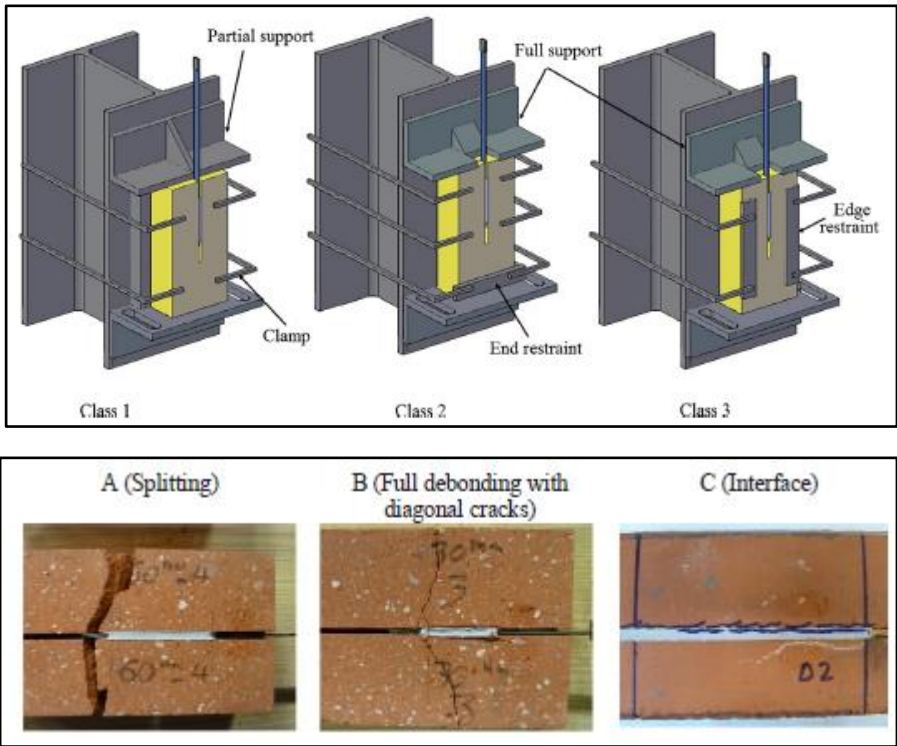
Test setup improvements and Typical failure modes. [11]
